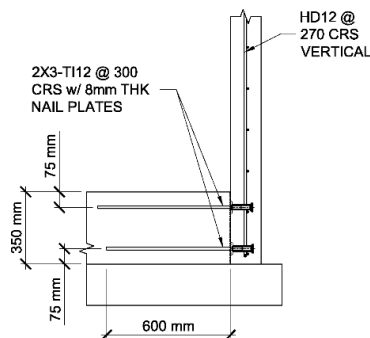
Detail of shallowly embedded threaded insert connection (Panel TI12-C42)
